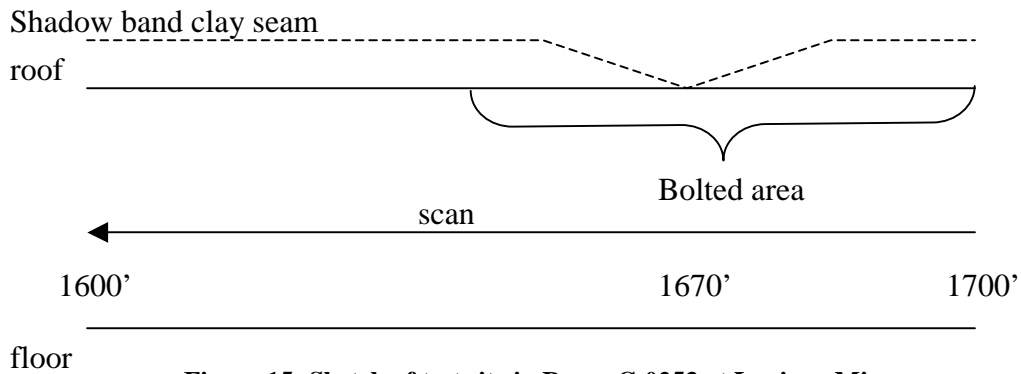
Sketch of test site in Room C-0253 at Lanigan Mine.
